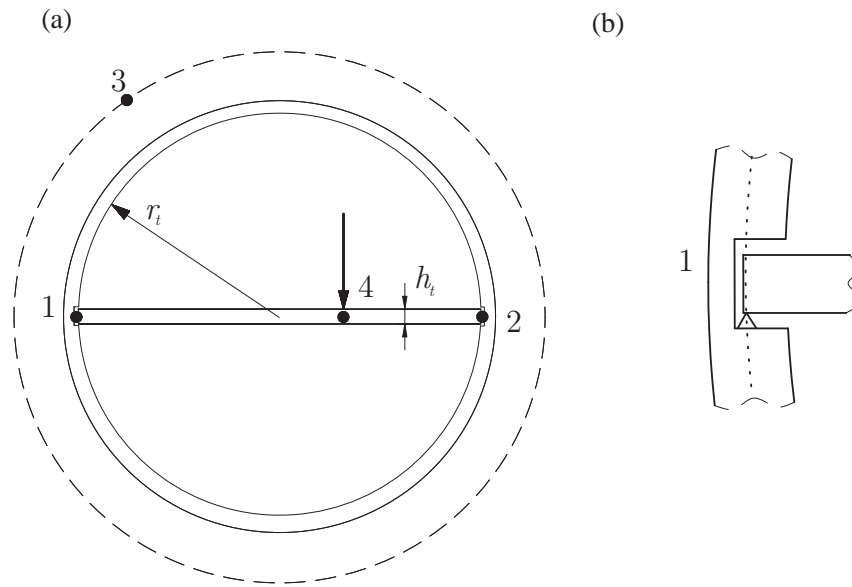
(a) Cross-section of the double-deck circular tunnel model. (b) Coupling hypothesis between the interior floor and the tunnel.
